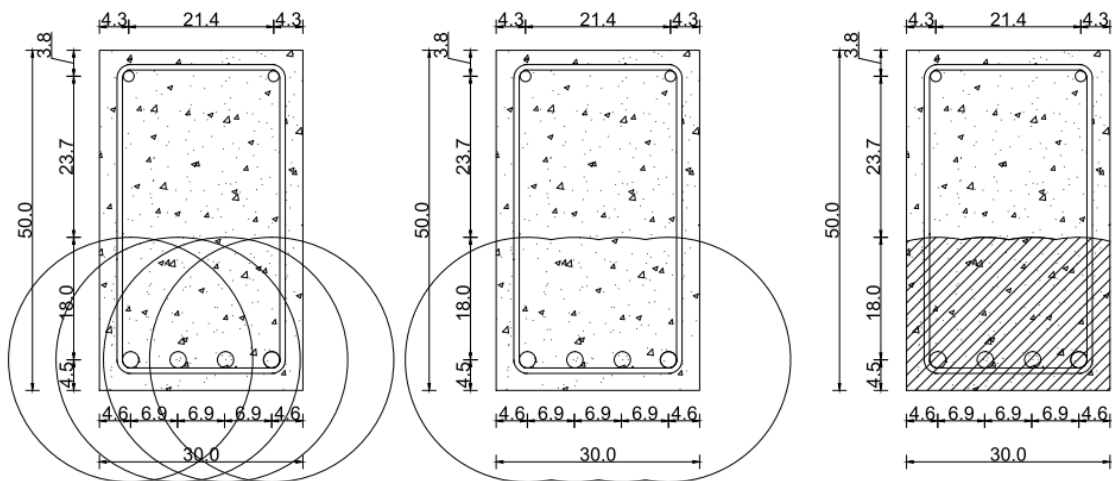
Proposed effective reinforced concrete section in the tension zone designated as proposed approach max.
